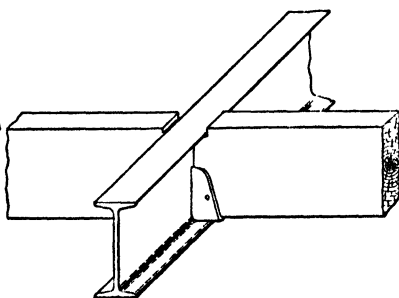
Wooden Beam Framed to I Beam with Duplex Hanger
